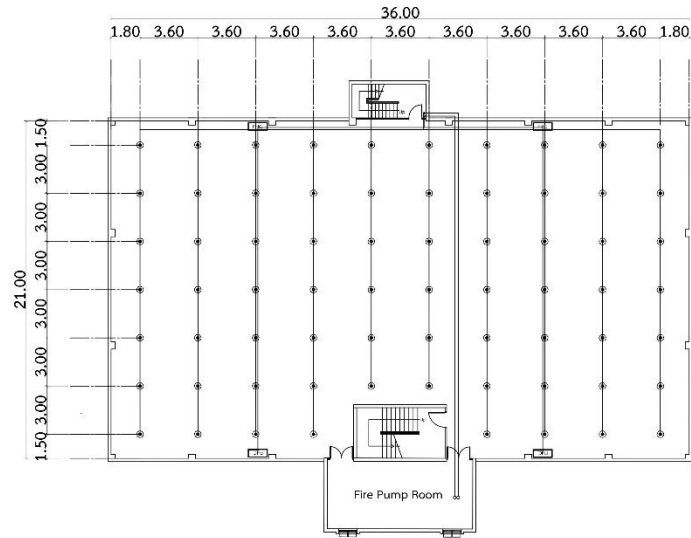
The design of a sprinkler system for the basement (in meters) : 10 branch lines, 7 sprinklers per line
